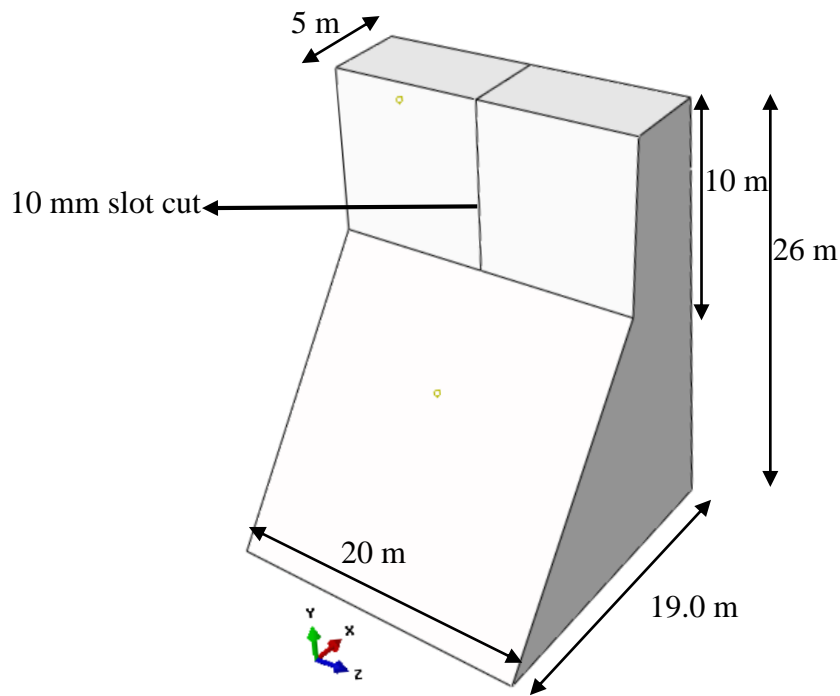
Layout and dimension of the assumed dam with 10 mm slot cut.
